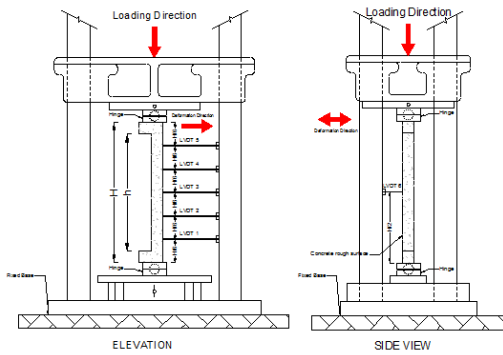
Elevation and Side View of Typical Columns Lateral Displacement Instrument Setup (LVDT).
